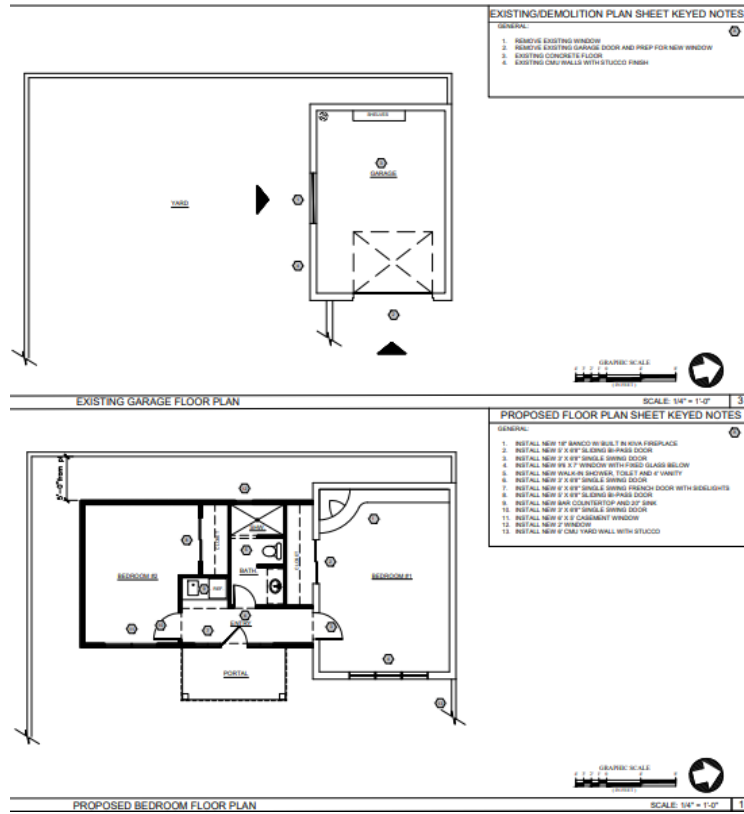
Existing and Proposed Floor Plan of the garage structure.
